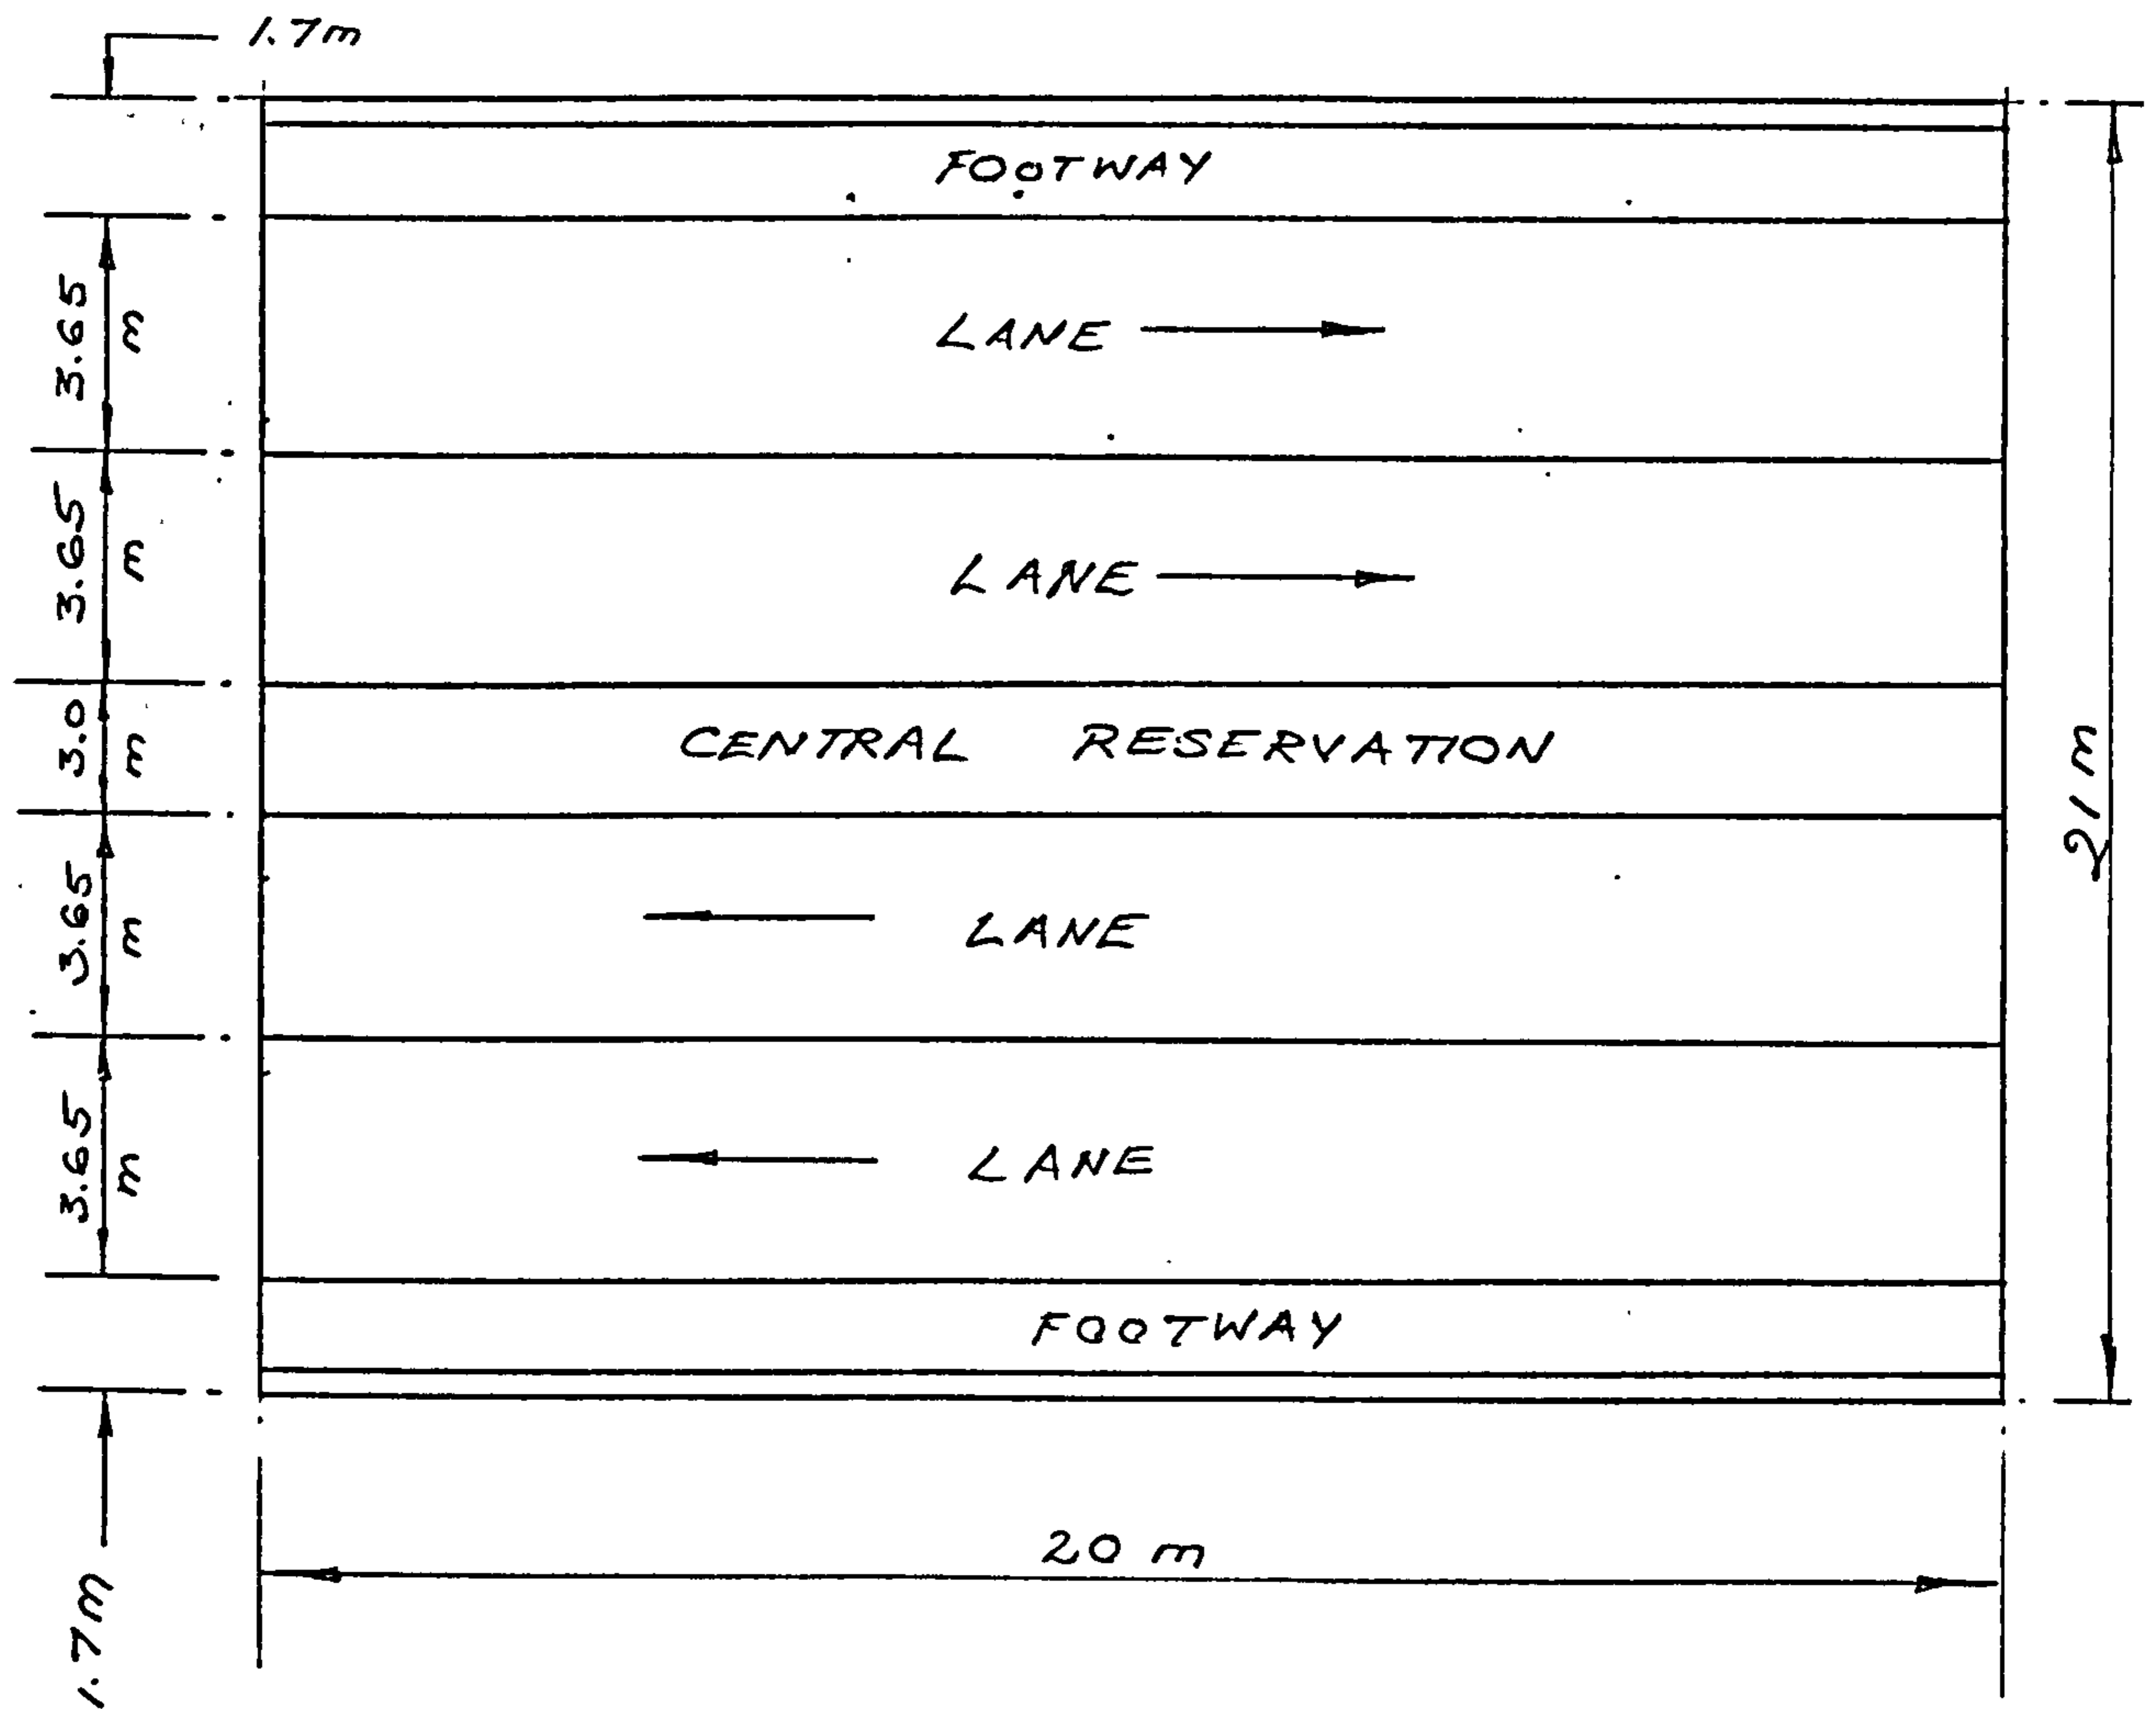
A 20m span two lane dual carriageway slab bridge.
